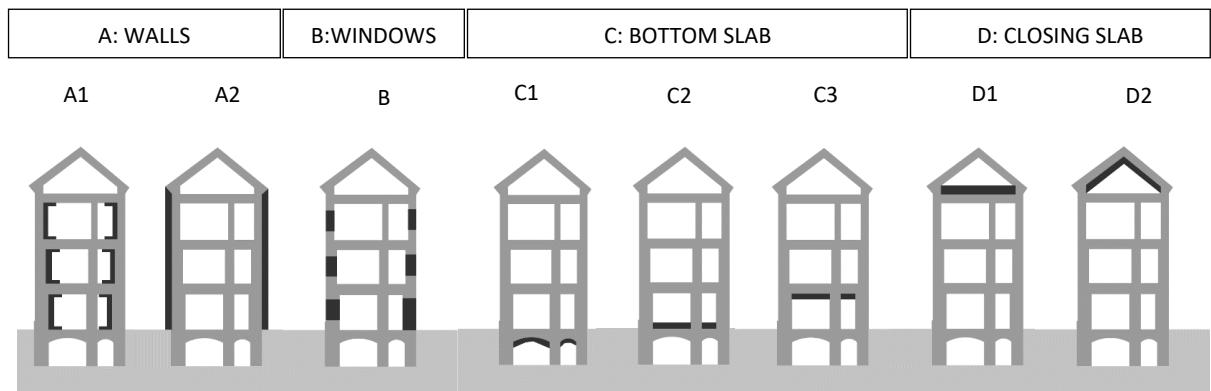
Main heat insulation possibilities on enveloping structures in the case of heritage respecting modernization A: Wall insulation: A1: Outside insulation of the façade, A2: Inside insulation of the façade; B: Window renovation; C: Bottom slab insulation: C1: Underside insulation of cellar vault, C2: Floor insulation, C3: Underside insulation in case of arcade; D: Roof insulation: D1: Closing slab insulation, D2: Pitched roof insulation (source: Authors' own figure)
